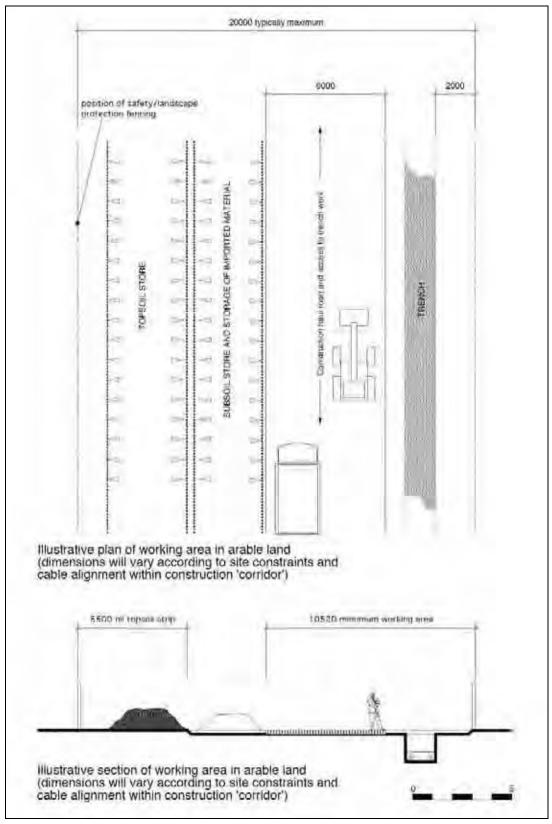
Illustrative arrangement of typical working area in farm land (plan and section)
